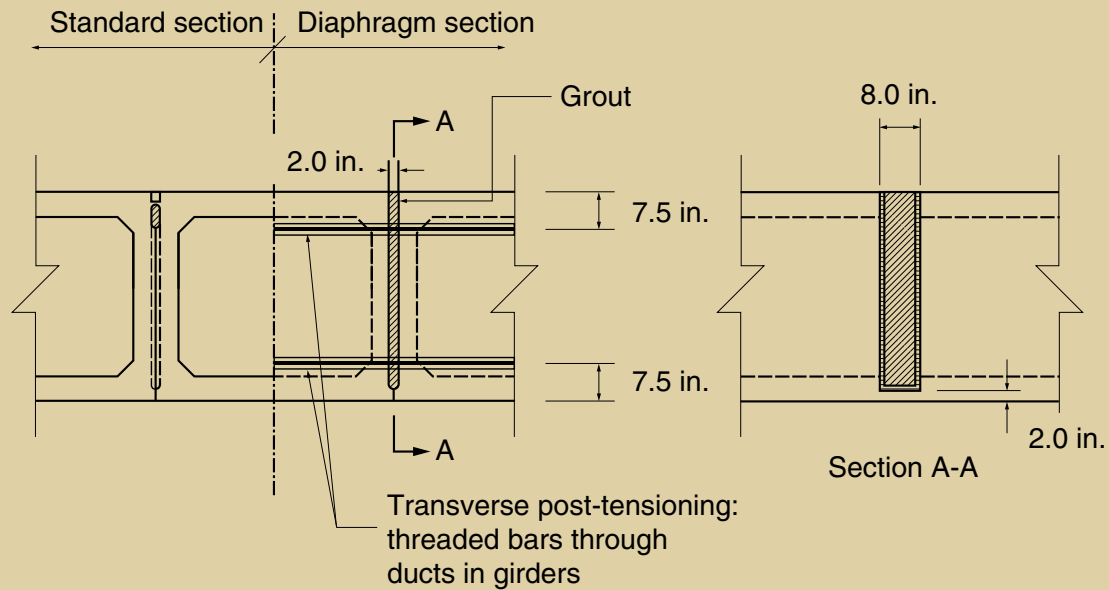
The transverse diaphragms are made continuous across the entire width of the bridge using grouted full-depth shear keys and post-tensioning tendons. Source: Figure 8.9.3-1. PCI Bridge Design Manual Steering Committee, *Precast Prestressed Concrete Bridge Design Manual* (Chicago, IL: PCI, 2003). Note: 1 in. = 25.4 mm.
